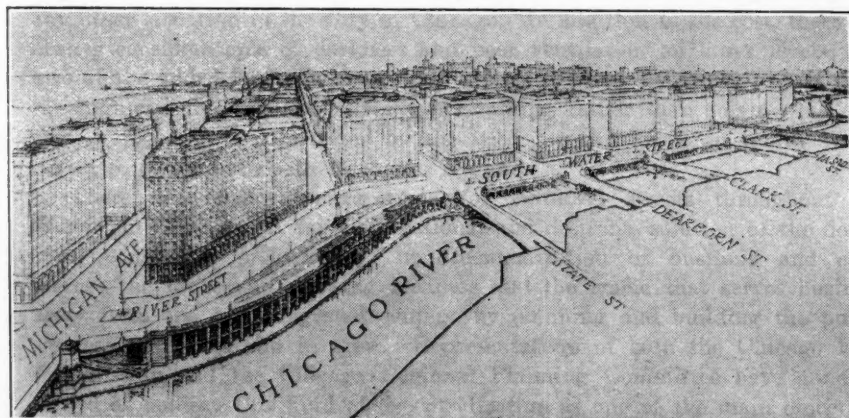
THE SOUTH WATER STREET IMPROVEMENT (PROPOSED), EXTENDING WEST FROM MICHIGAN AVENUE.
